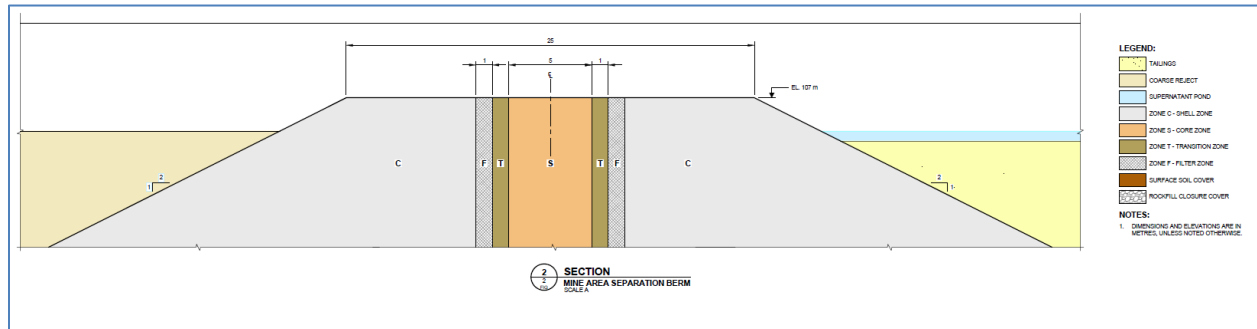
Mine Area Separation Berm Source: KP (2024)
